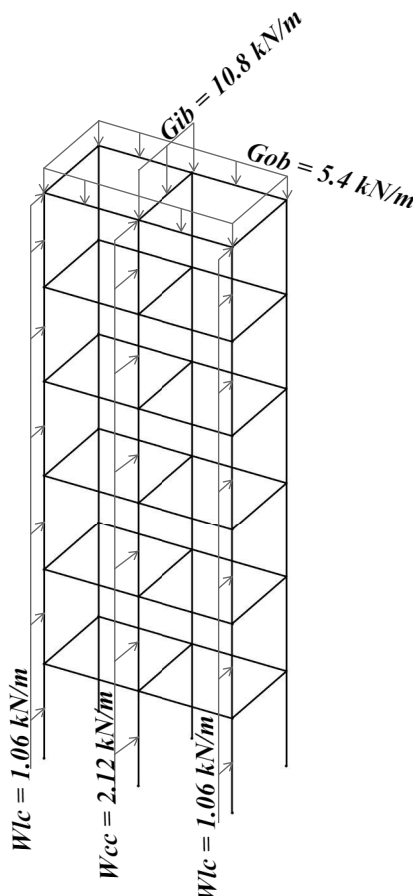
78 bar spatial frame with horizontal and vertical loading
